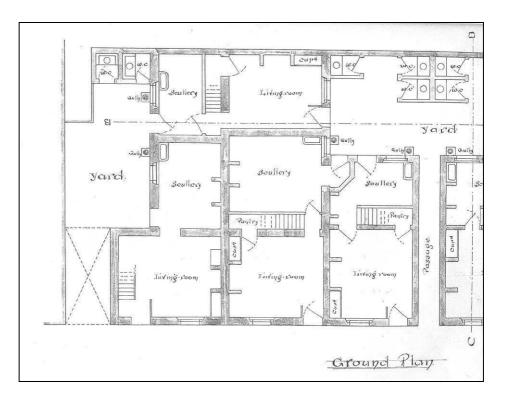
Ground plan of houses on South George Street (CAC Ref: Ca/E4/2162)
